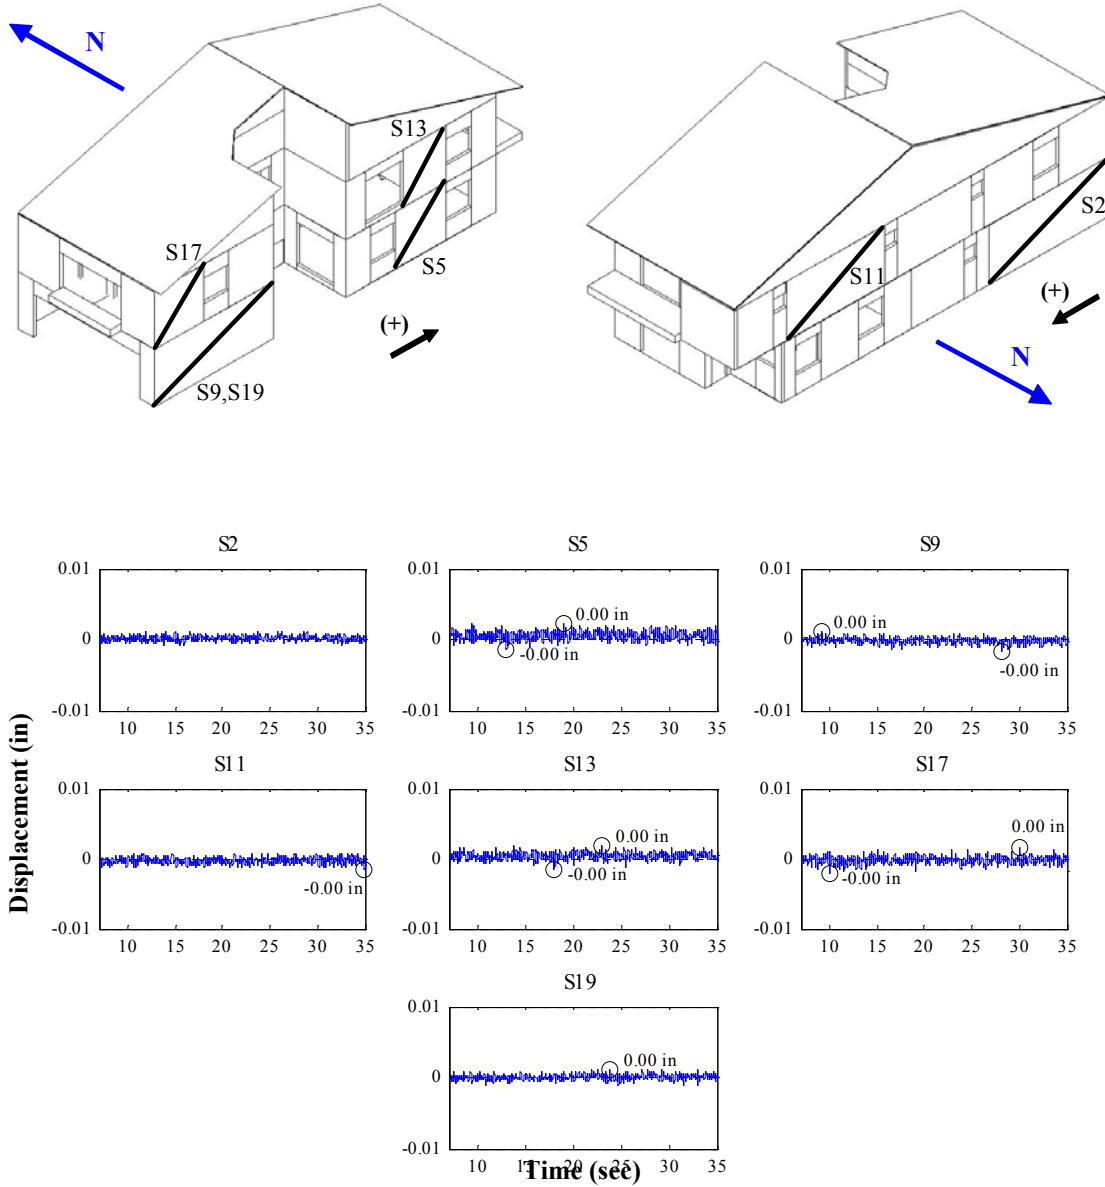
Wall deformations of east-west external walls for Test NWP4S01
